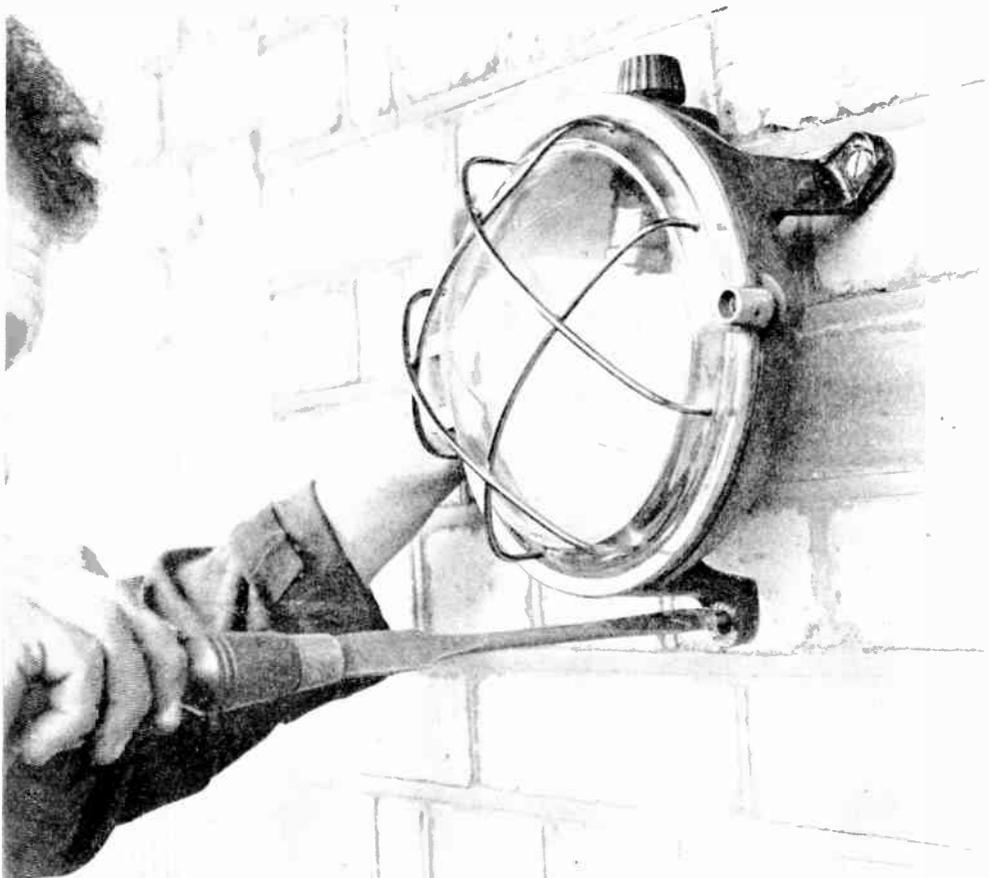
SCREWING A PROTECTED WALL LAMP TO A WALL.
